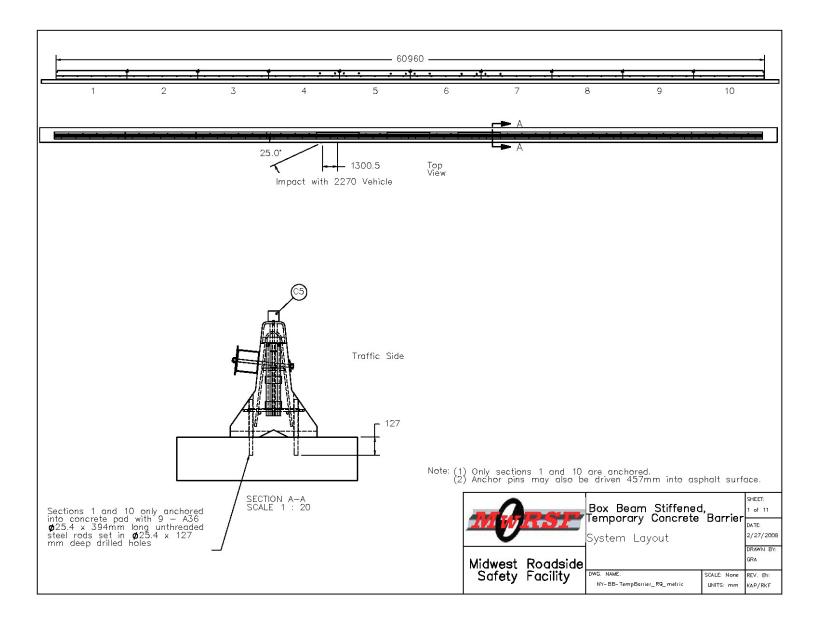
Stiffened Temporary Concrete Barrier System Layout, Test NYTCB-1
